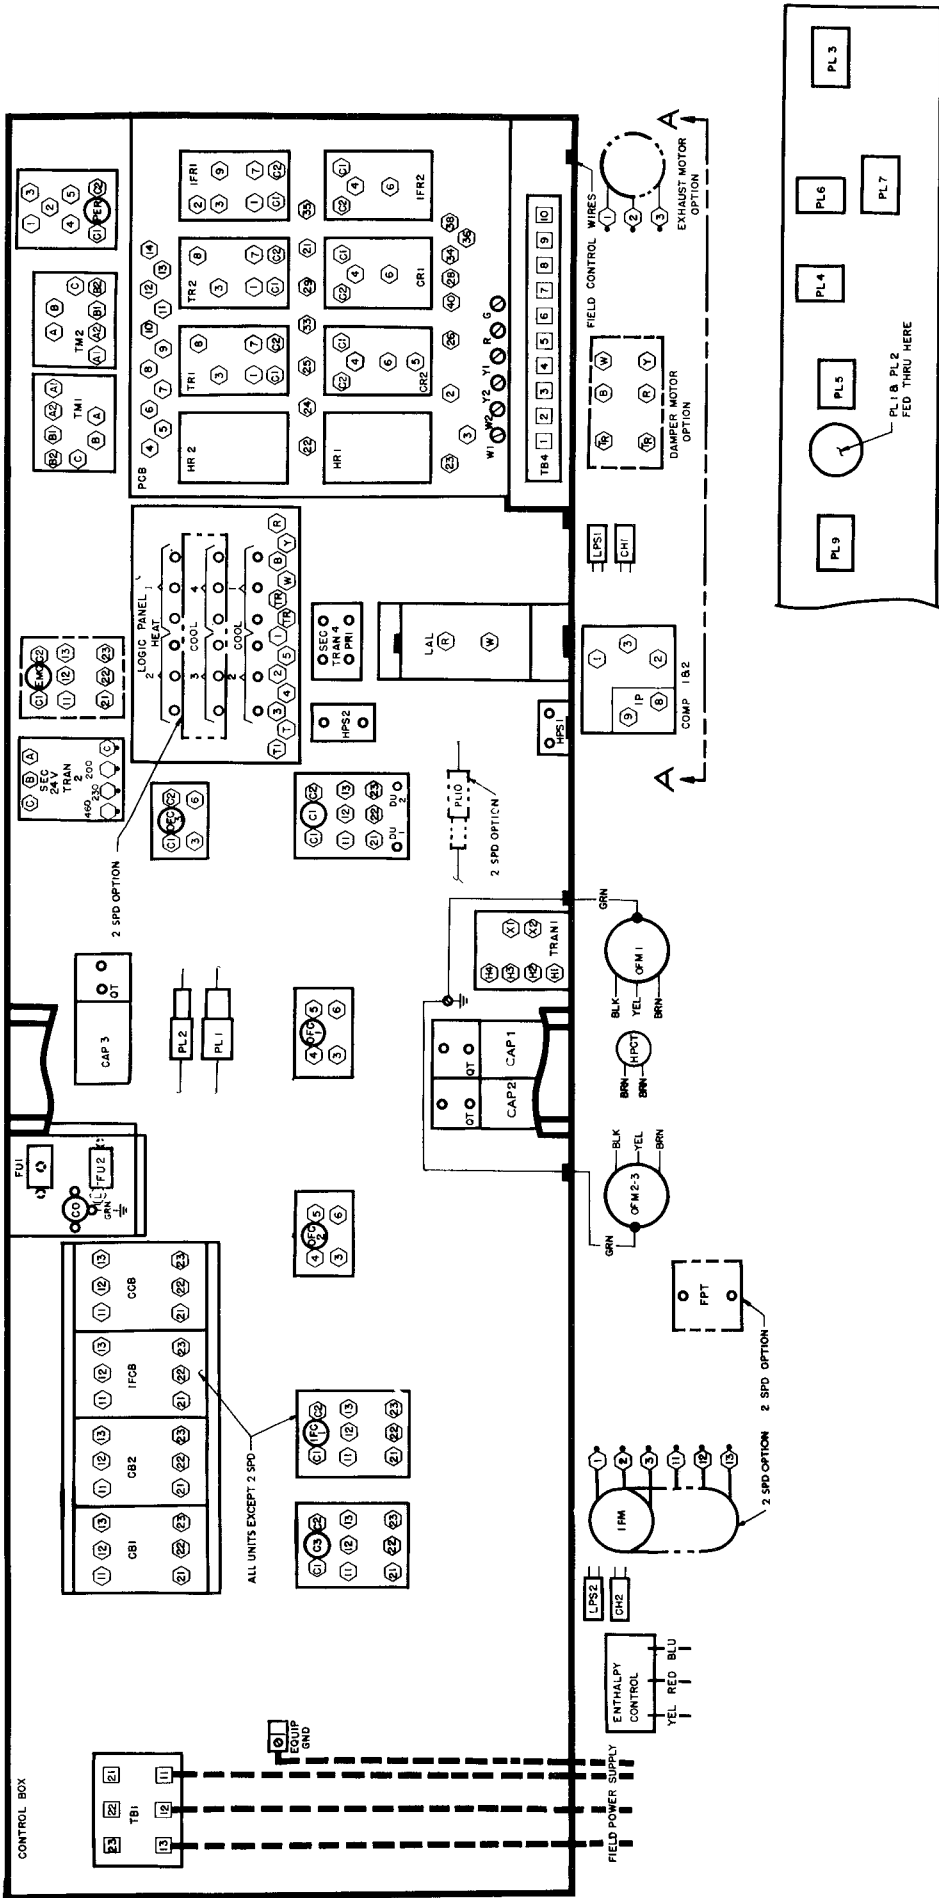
Component Arrangement; 50DF028; 460, 575-3-60
